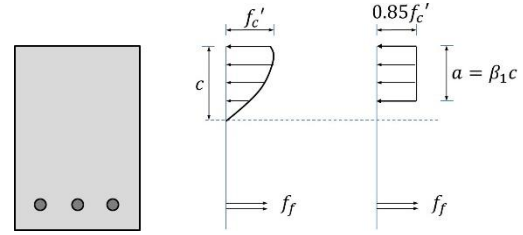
Failure stress diagram of SMF-B specimen (governed by GFRP rupture)
